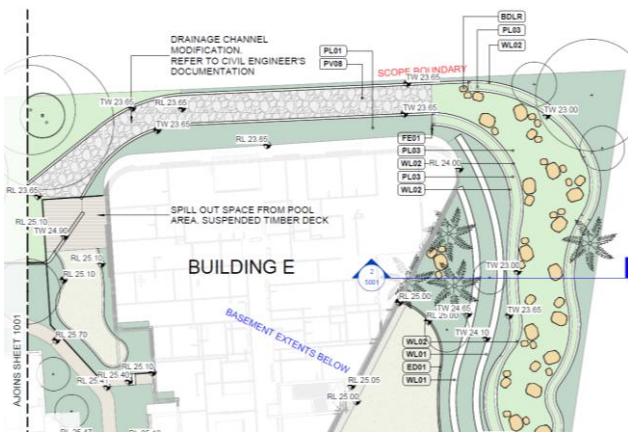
Northern channel landscape plan (as proposed in RtS and Amendment Report 1)
